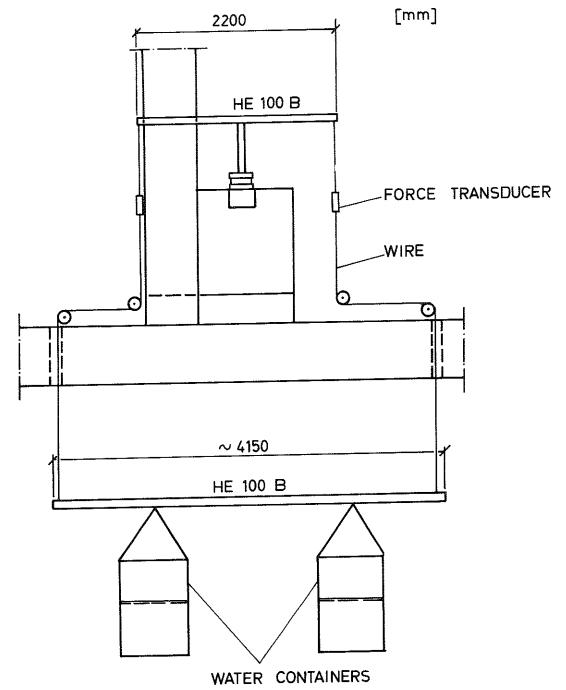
Construction for load arrangement. Section through the short side of the furnace.
